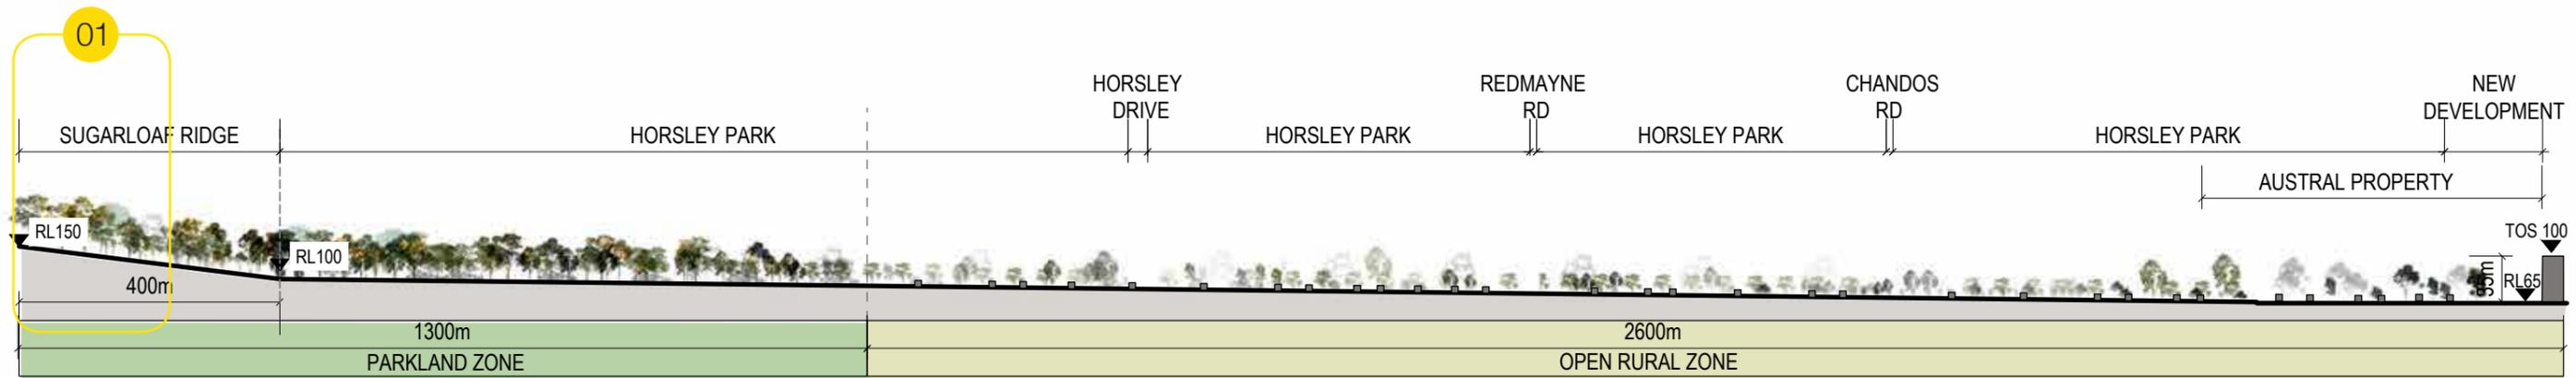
Section 01 - Sugarloaf Ridge to the site
